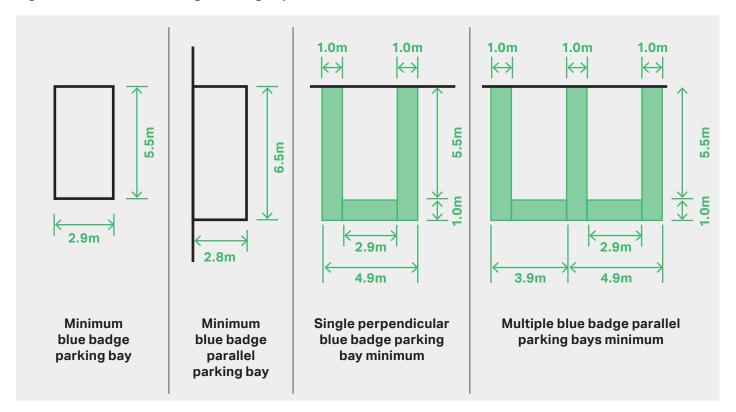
Minimum Blue Badge Parking Bay Dimensions
